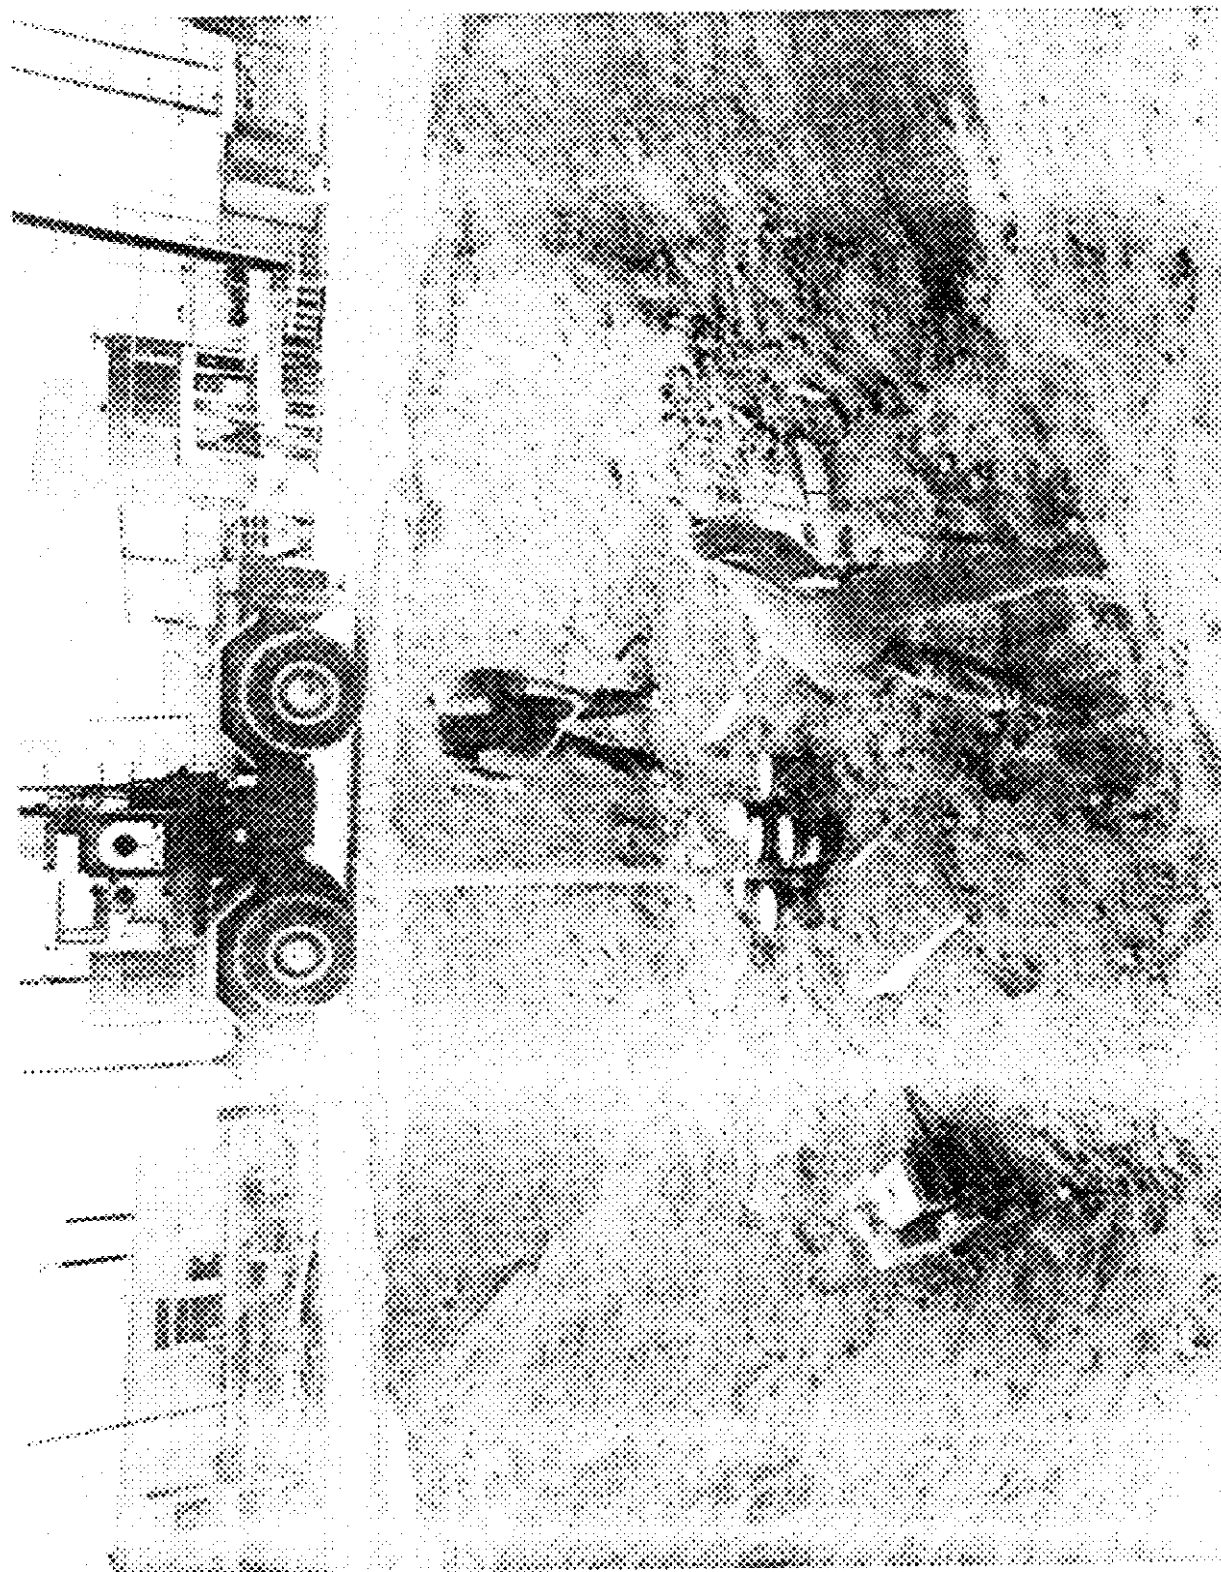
Backfill being placed over cans, tracer cans containing terbium oxides, and boxes in layer 2 of Test pit 1.
